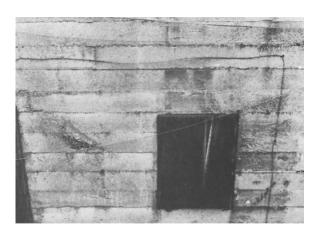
Pre-1940 cast-in-place concrete with formwork pattern.
